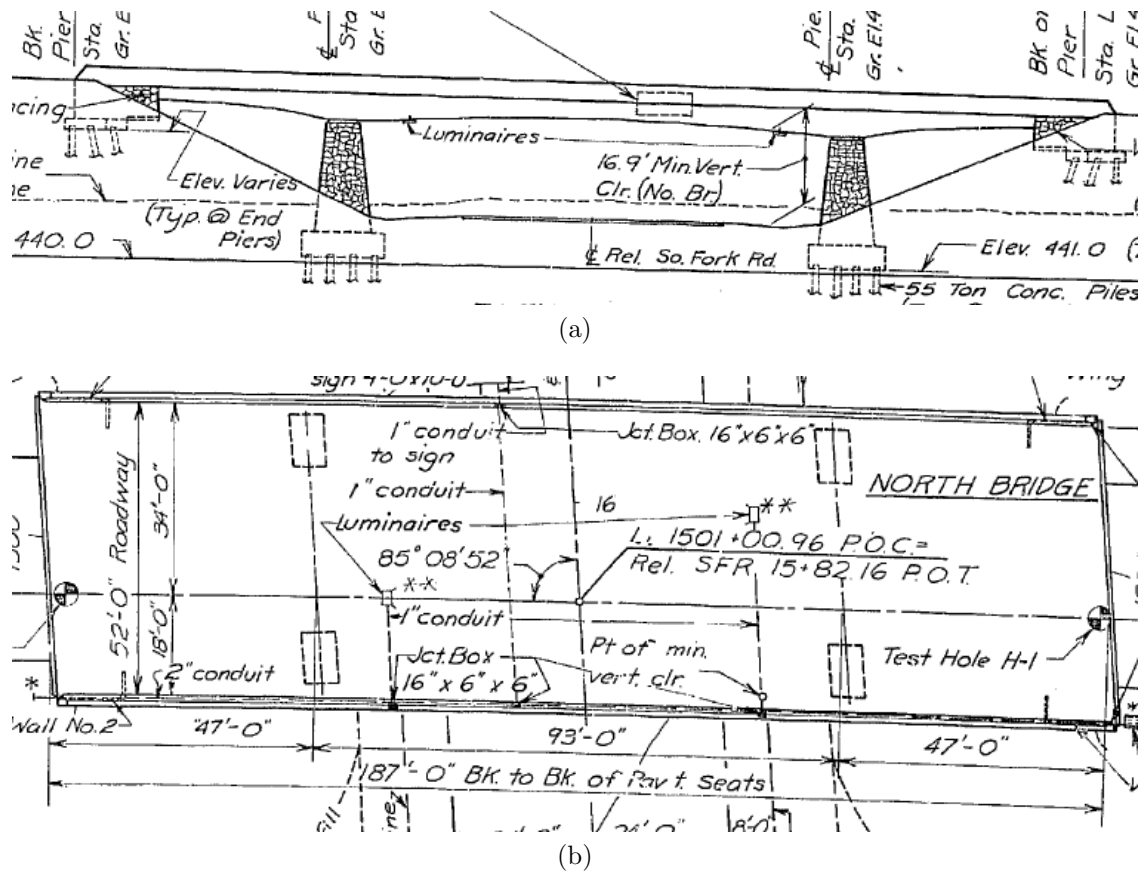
Bridge 6 in (a) elevation and (b) plan view
